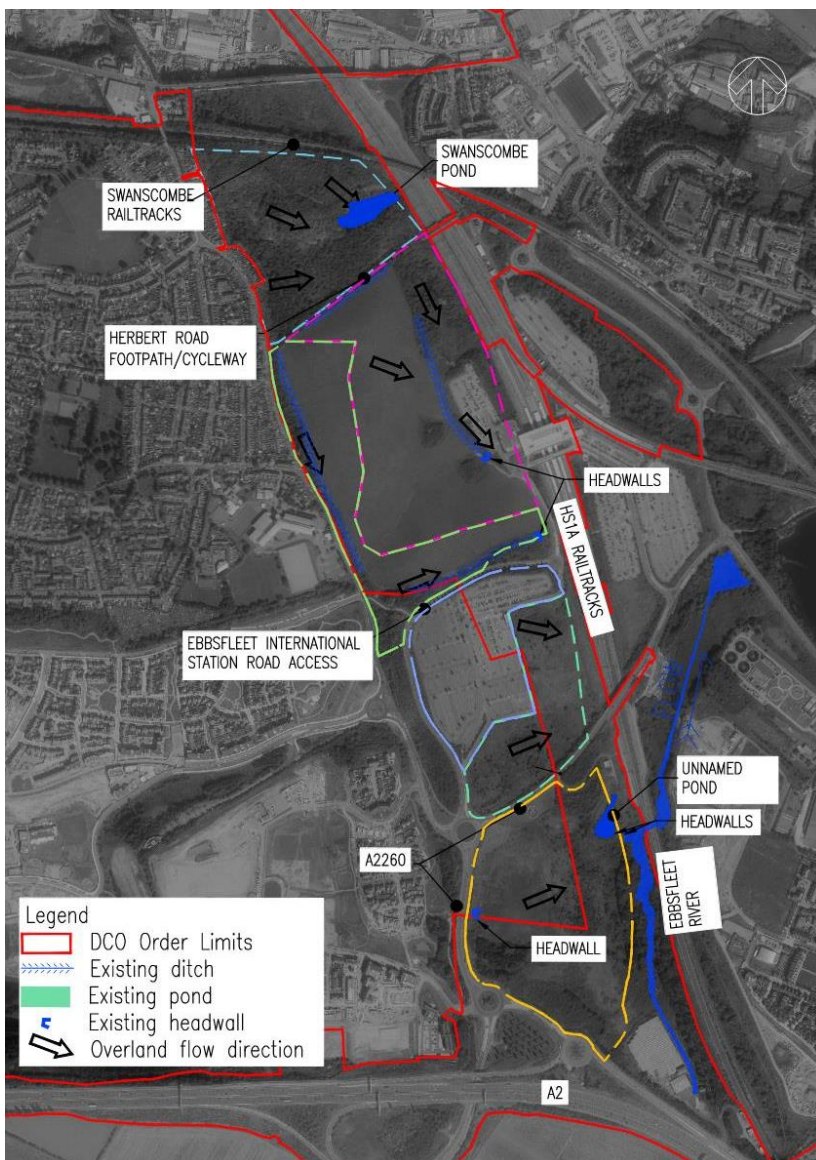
Kent Project Site (Access Road) existing drainage structures
